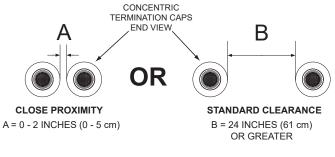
Two Concentric Terminations - Through a Roof or Sidewall
